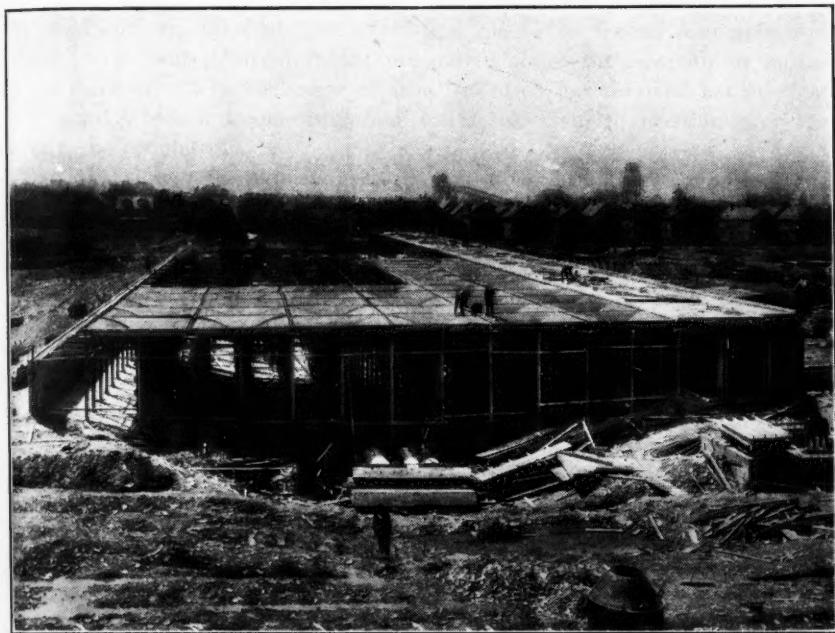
VIEW SHOWING FORMS FOR GROINED ARCH ROOF OF COAGULATION BASIN, BALDWIN FILTRATION PLANT.
